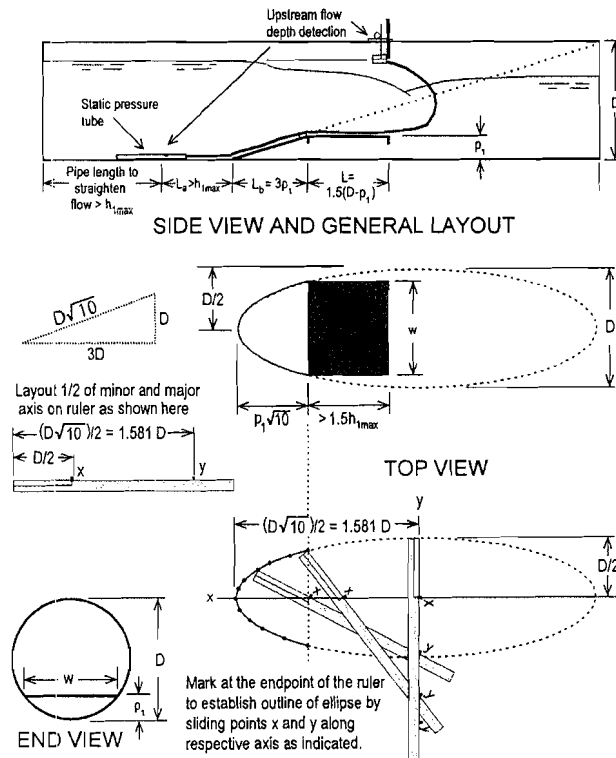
Layout of ramp and sill for constructing a broad-crested weir in a circular pipe
